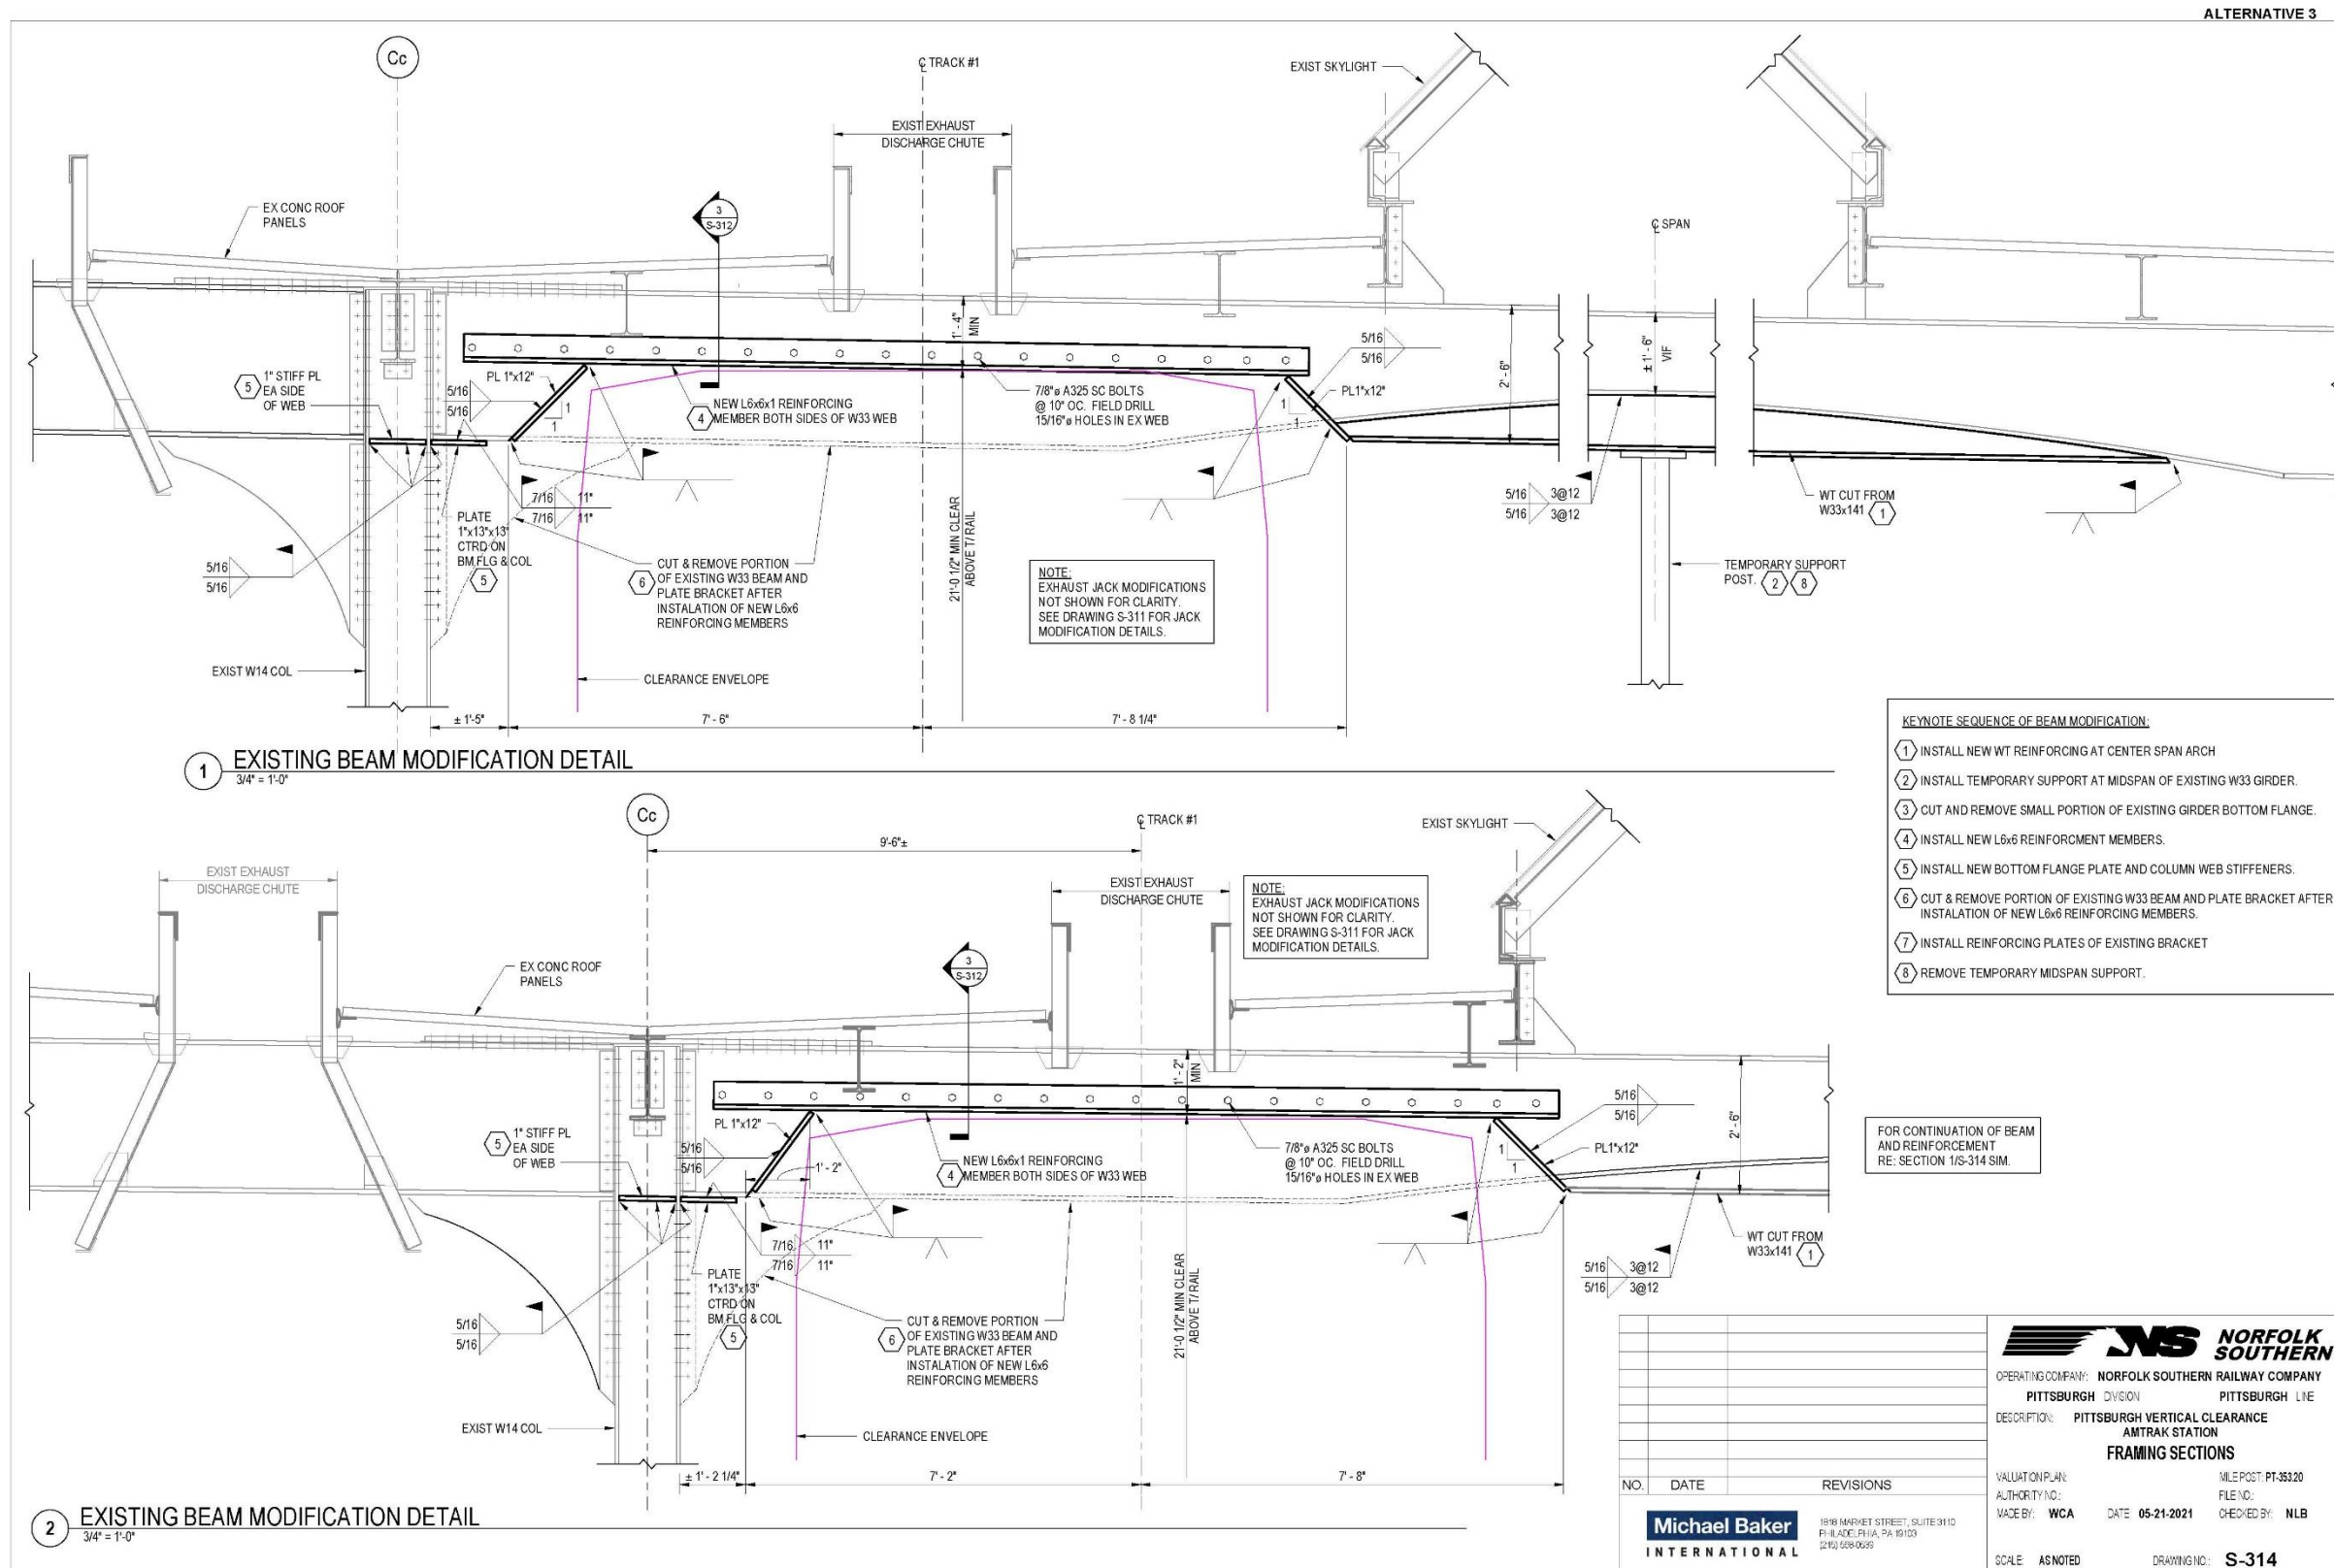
Plan sheet showing modifications to beams over track 1.
